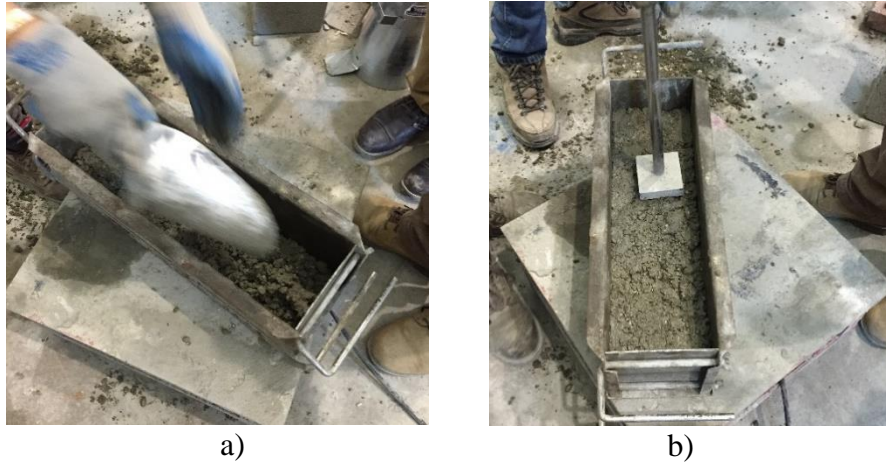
(a) pouring the concrete into molds (b) externally vibrating the concrete with vibrating table and compacting with rammers
